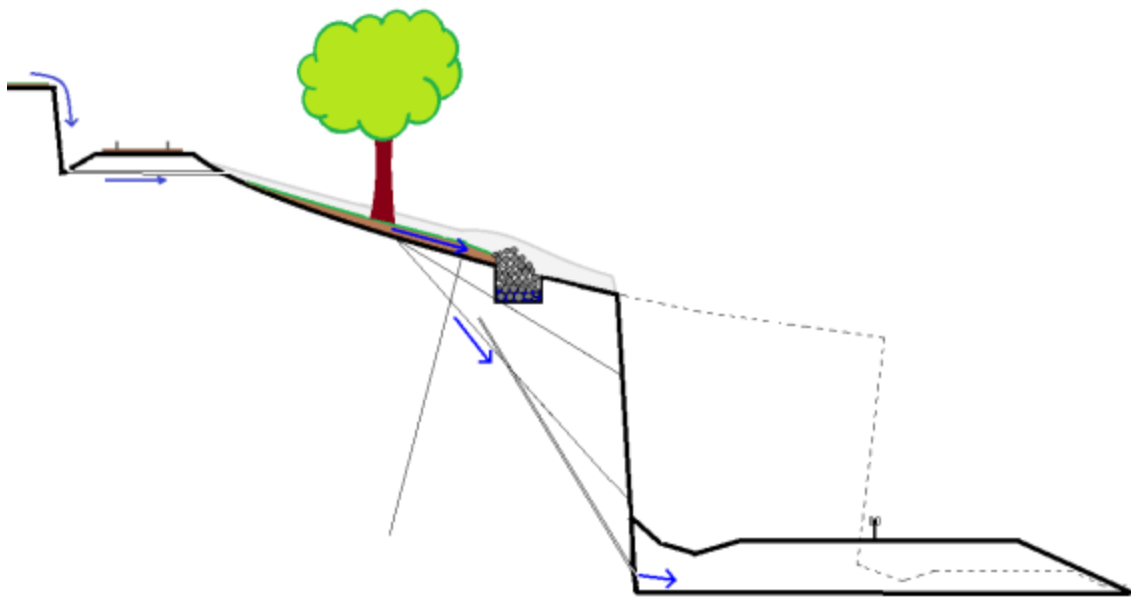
The rock cut with proposed countermeasures. A second option would be to skip the vertical drain hole and make a horizontal one instead. This would require a new waterway for the drained surface water.
